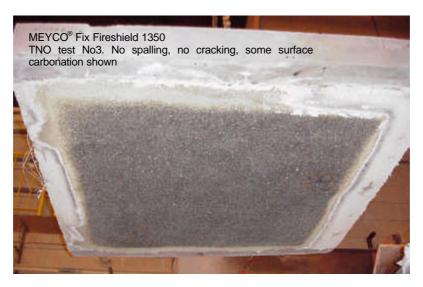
No spalling of passive fire protection or structural concrete observed on test panels.
